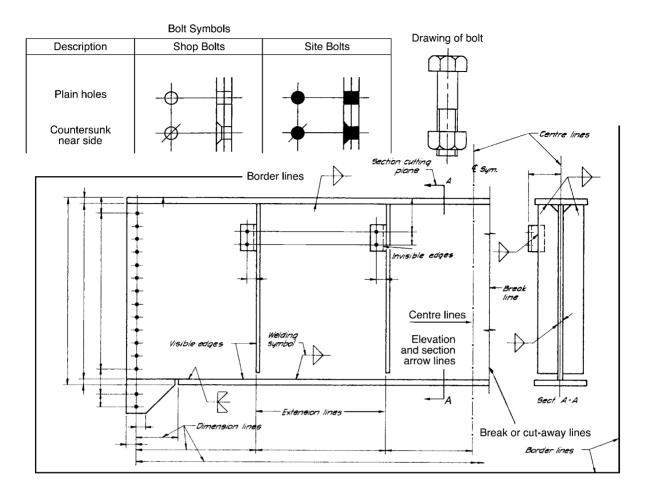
Drafting conventions for structural detailing (based on BS 5950 and EC3)
